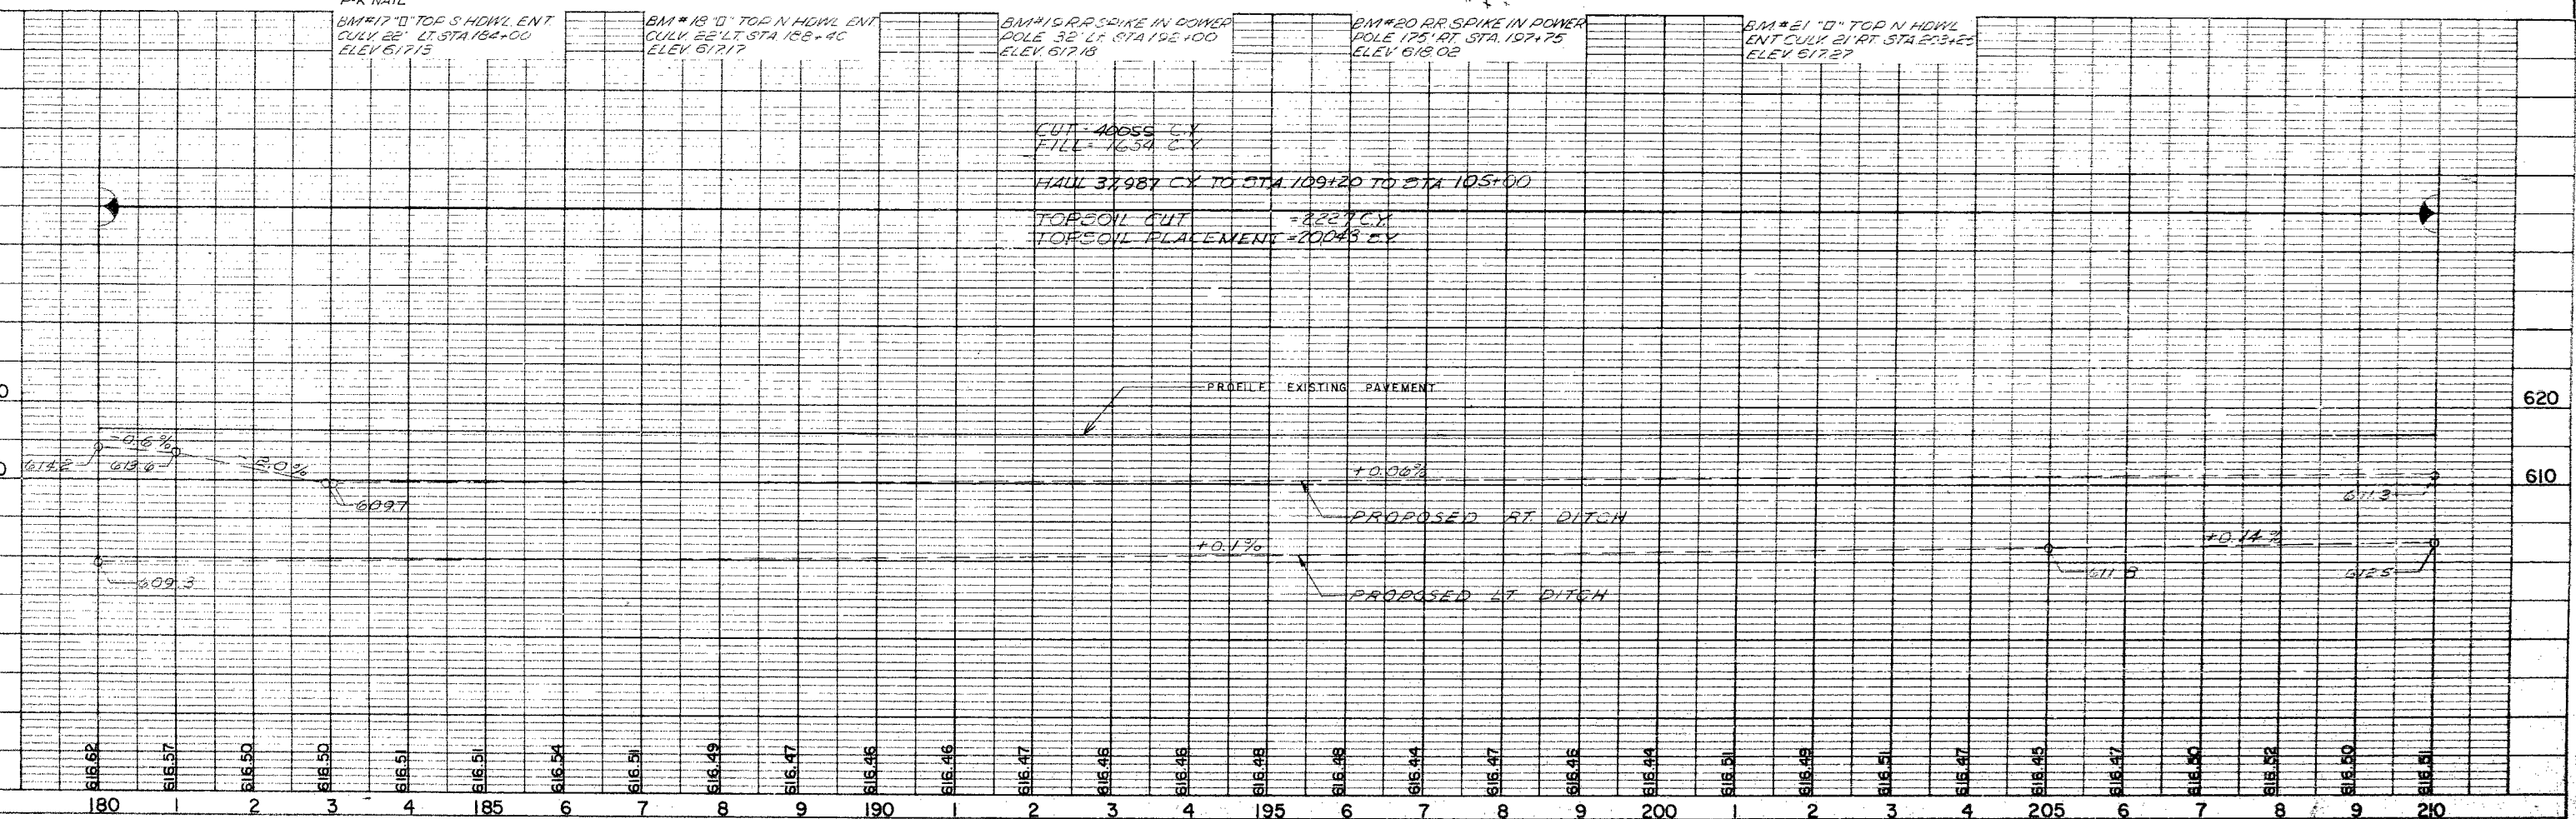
PLAN PROFILE & P. B. STANDARD
